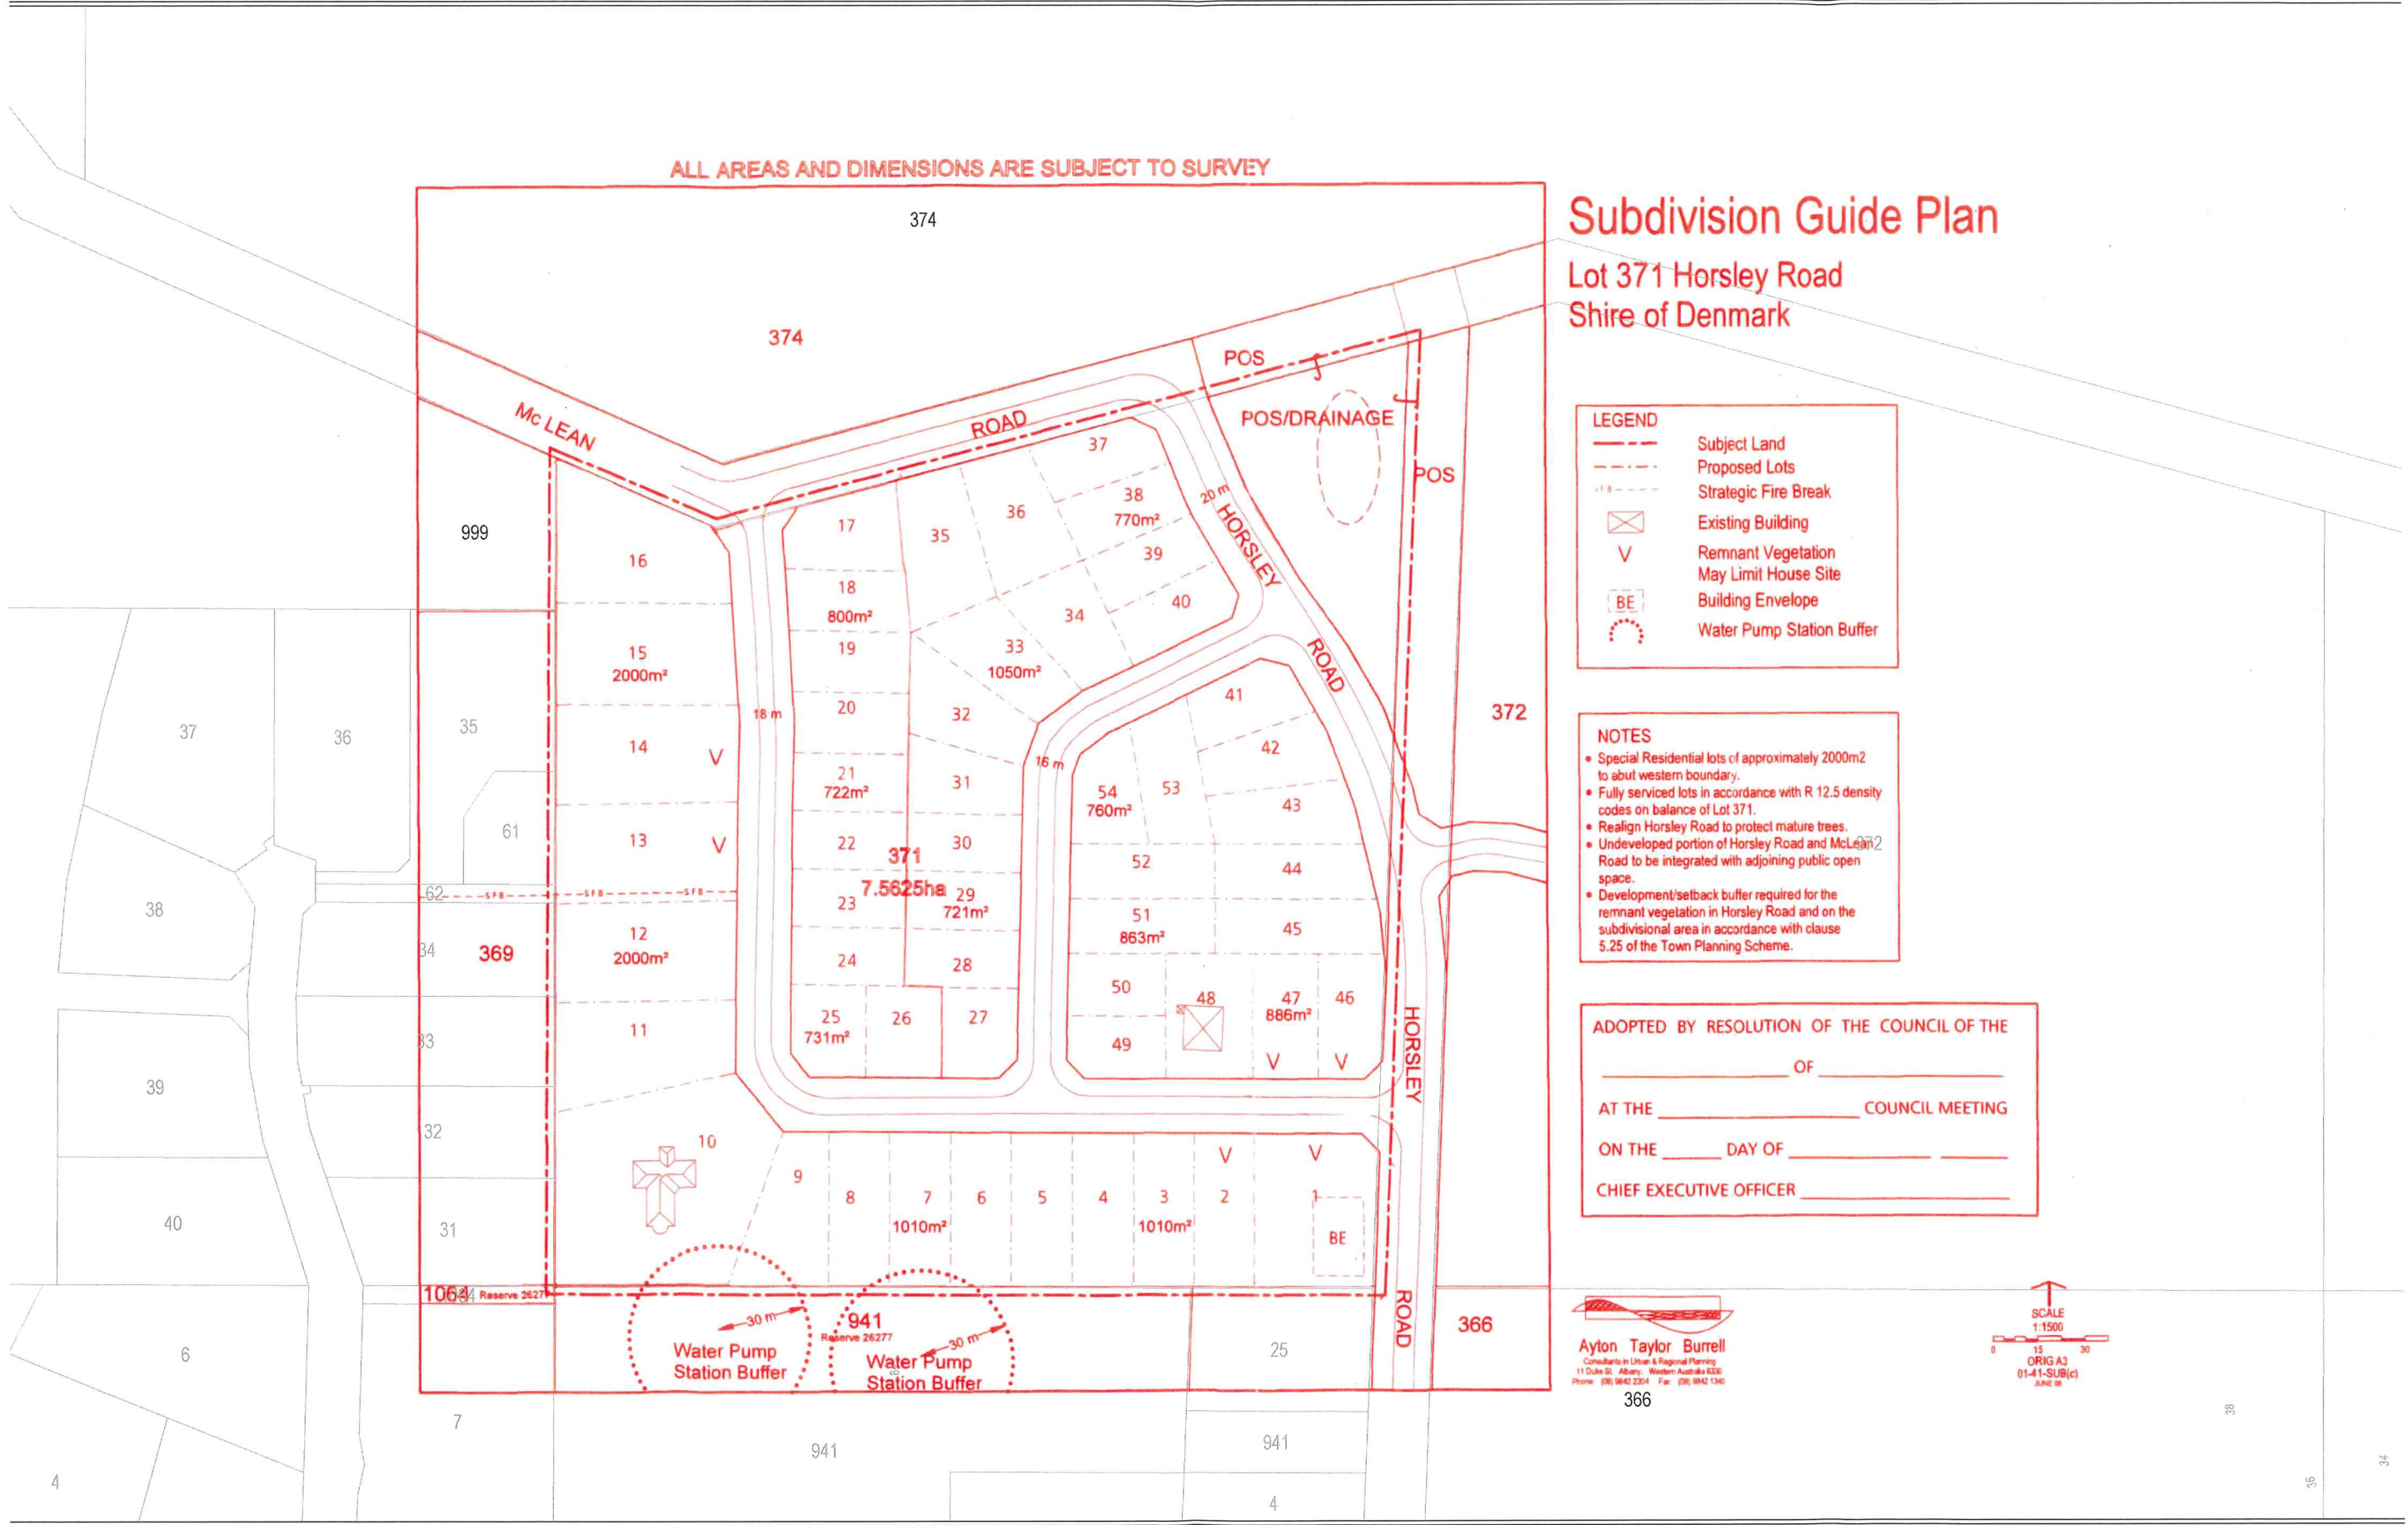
CURRENT SUBDIVISION GUIDE PLAN
